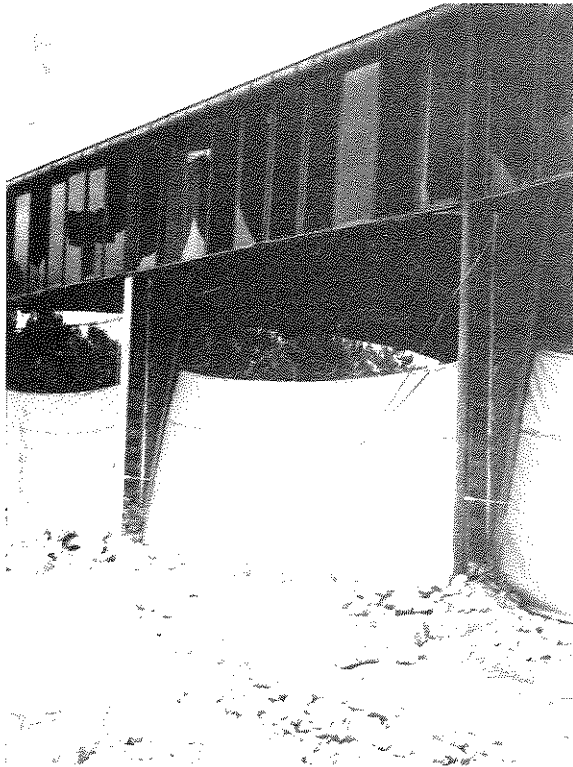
Light steel industrial building without structural damage after rupture of rod bracing.
